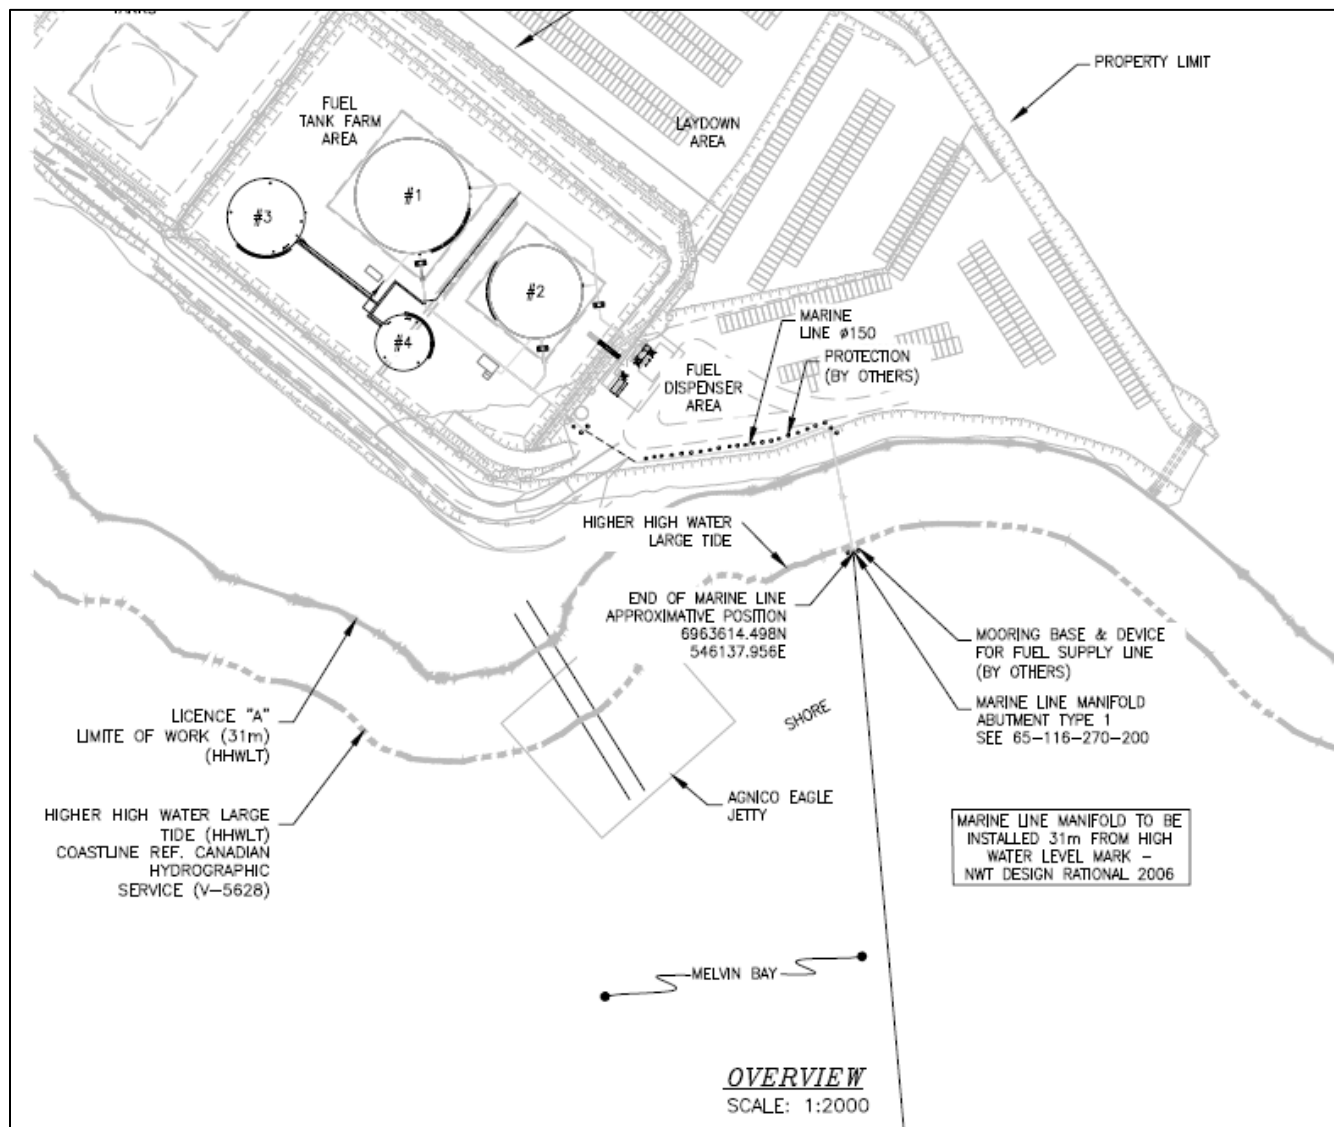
Itivia Site Fuel Storage and Containment Facility
